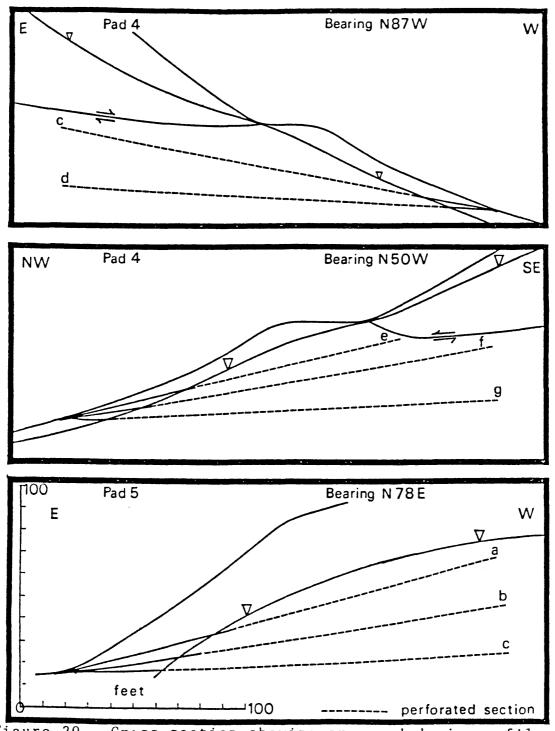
Cross section showing proposed drain profiles from drill pads 4 and 5.
